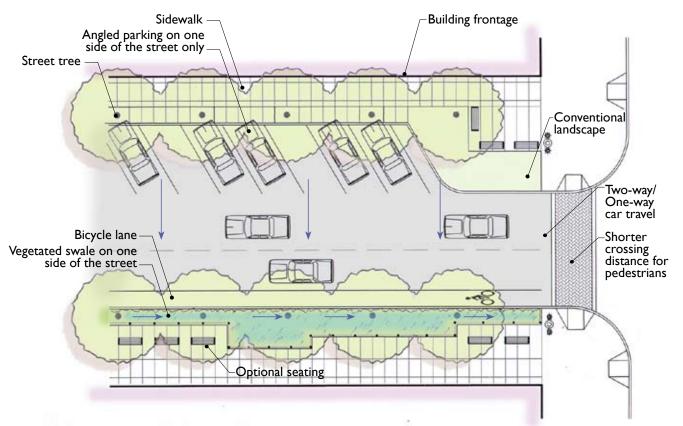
Curbless Street With a Vegetated Swale/Planter on One Side-Plan
